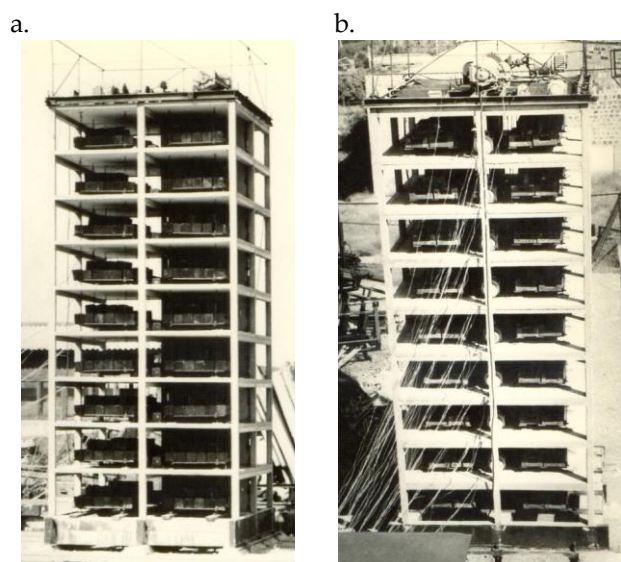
SERIES 111 NINE-STOREY FRAME BUILDING MODEL DESIGNED AND CONSTRUCTED ON A SCALE OF 1:5;
